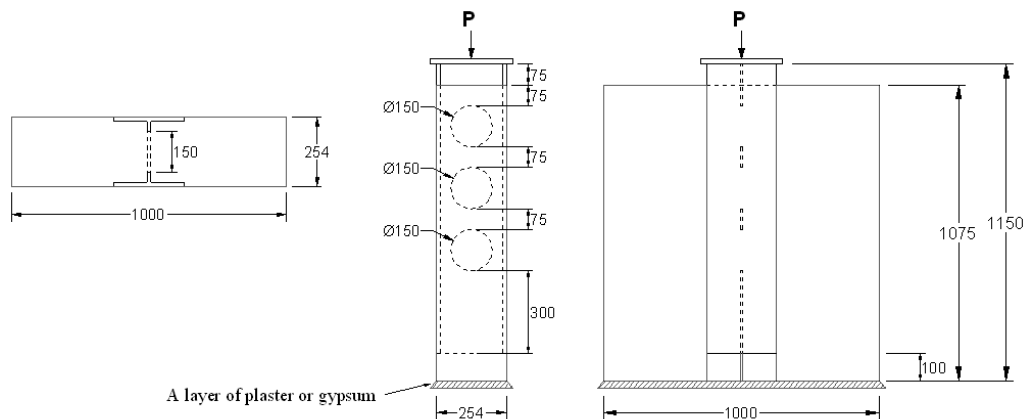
Test specimen of test group, T5, concrete-infill-only shear connection
